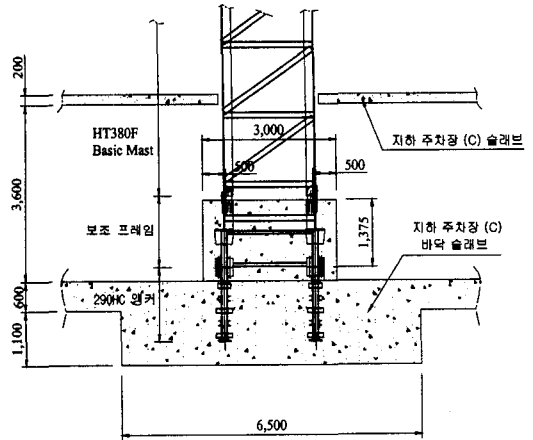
Plan that ensure the structural safety for the tower cranes used correcting frame
